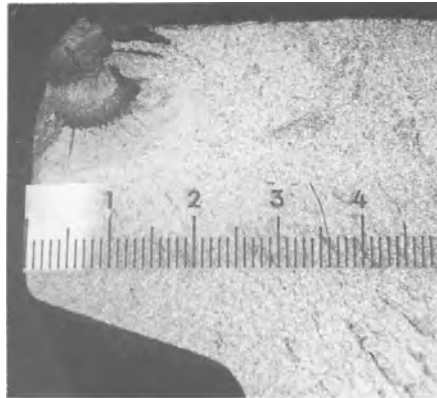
Transverse fracture surface of a rail with severe head checks, failed in the bending fatigue test
